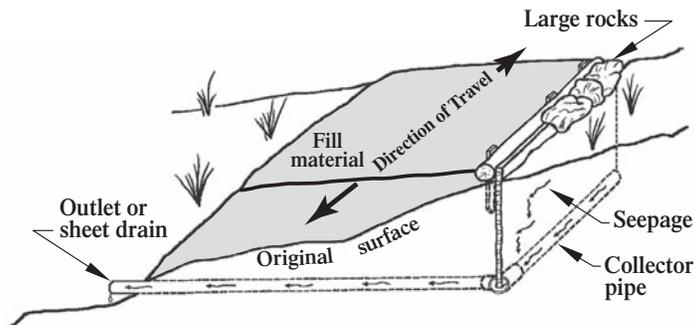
A sheet drain or geonet can be used to intercept seepage.
